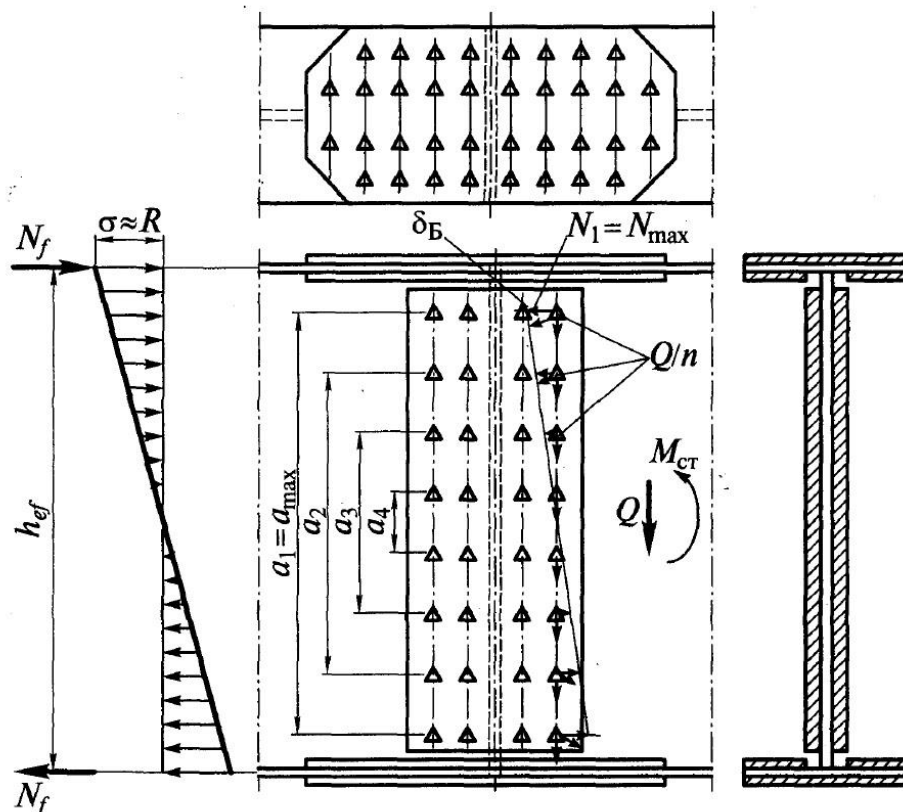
Assembly butt of the welded beams on the high-strength bolts
